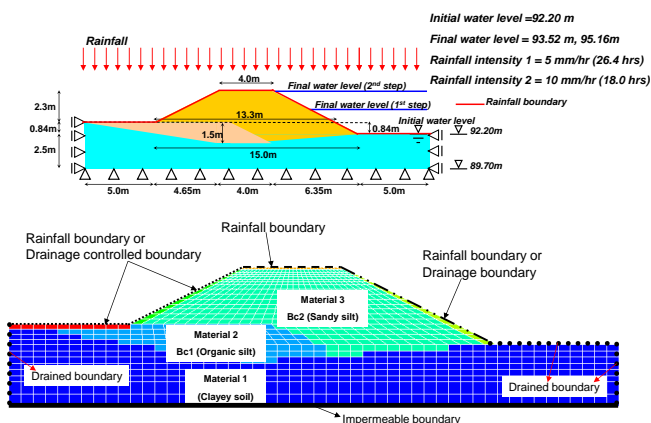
Cross section of the river embankment, element discretization, and boundary conditions
